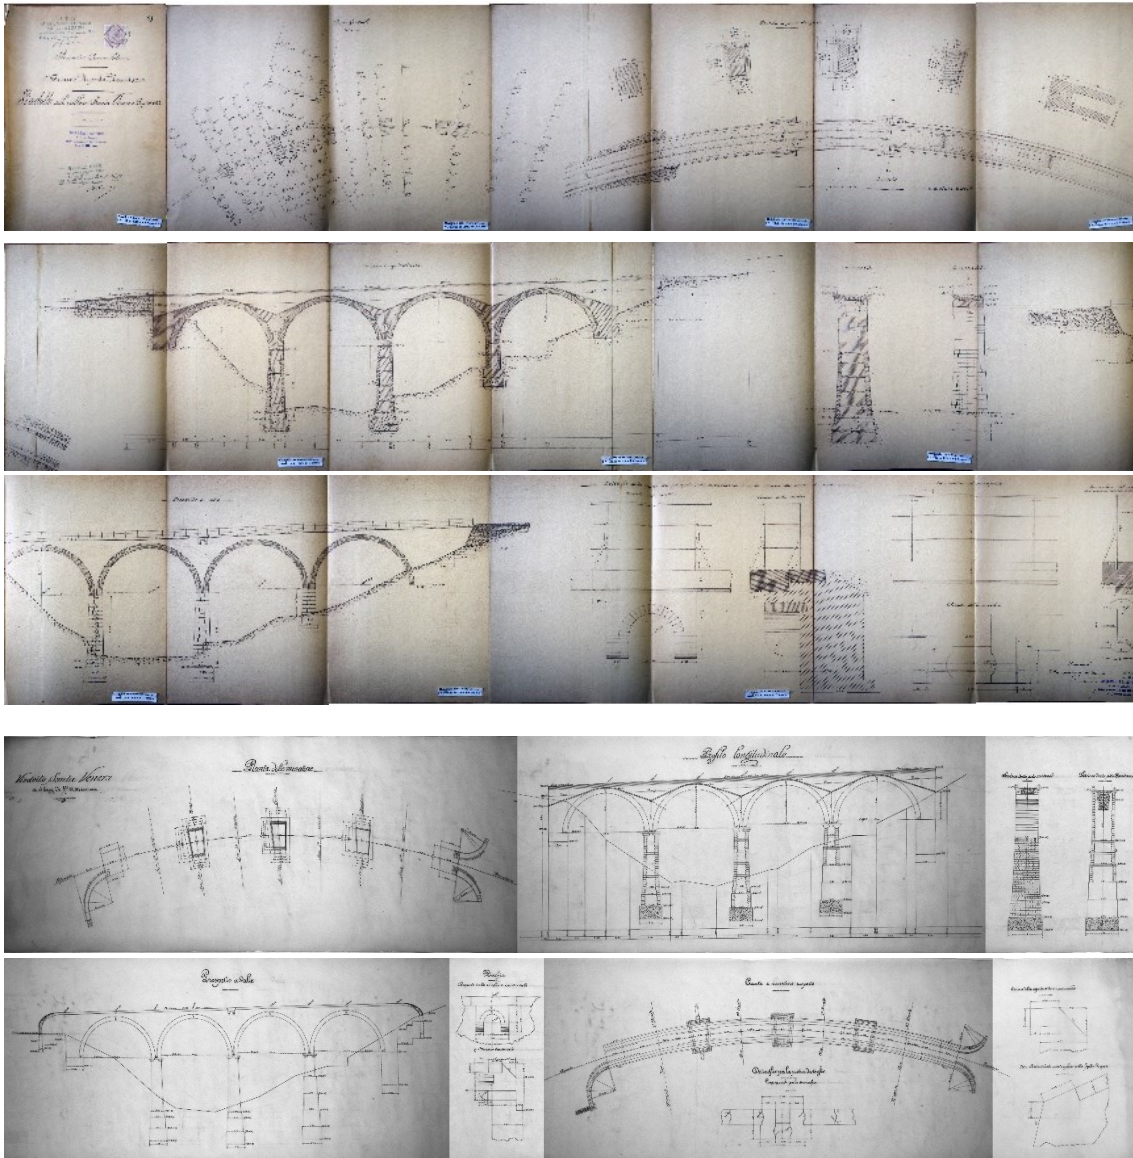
Top: The project of Santa Venera bridge found at the State Archive; bottom: the same project found at the archive of Circumetnea
